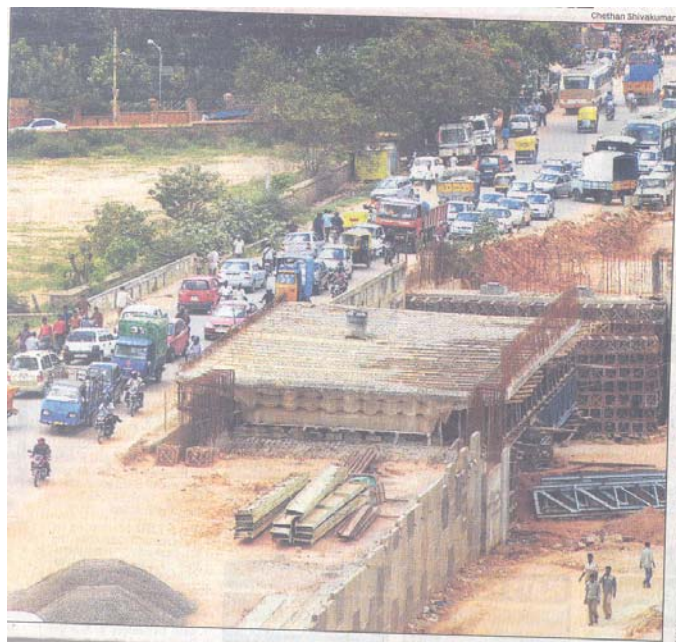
Construction of 3-lane ROB near existing narrow bridge at Marathahalli
